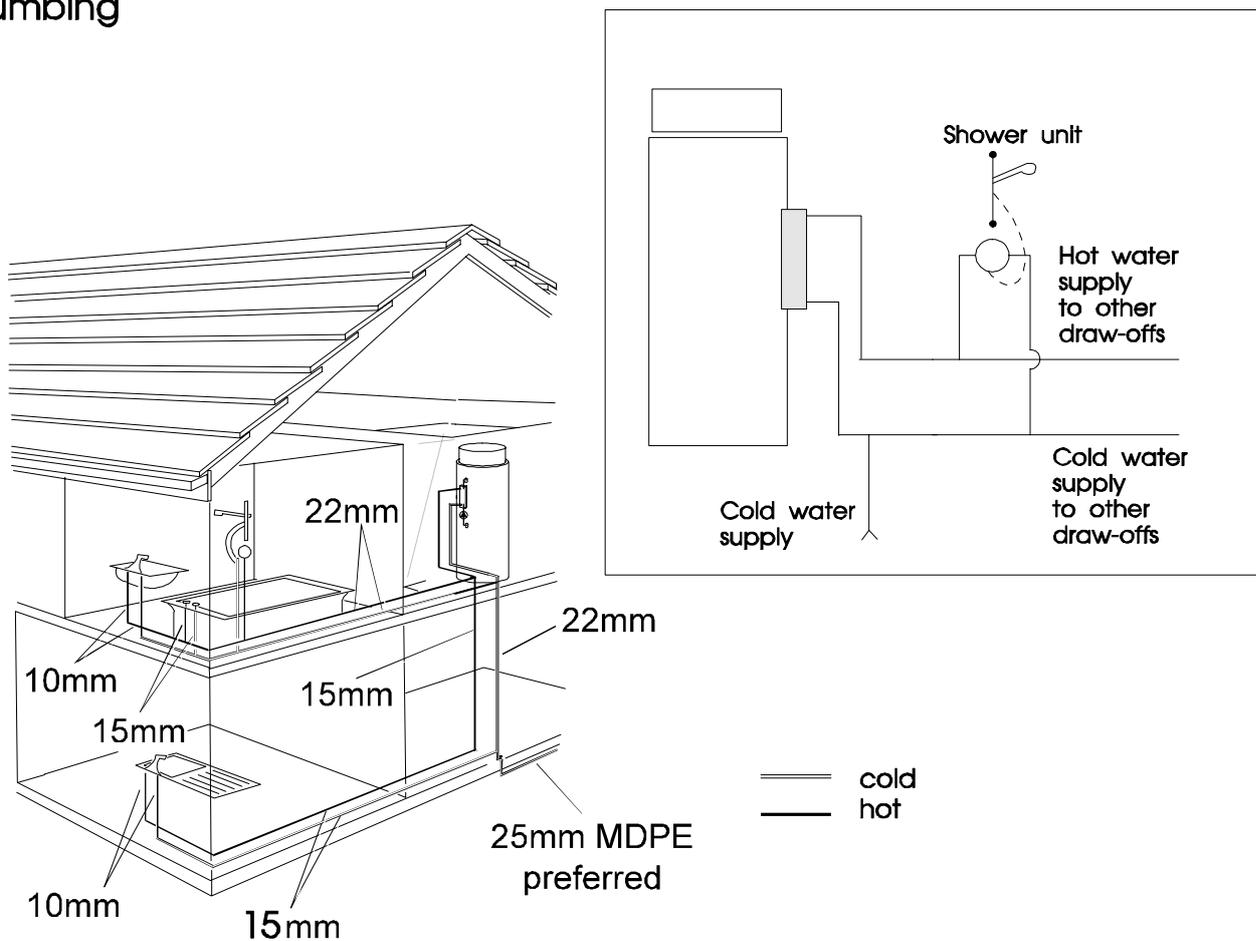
Schematic layout of typical domestic hot & cold water systems.
